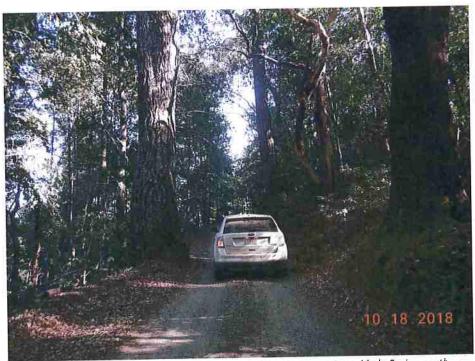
RP7. Pinch point. No sight distance restriction. Turnout provided. Facing south.
